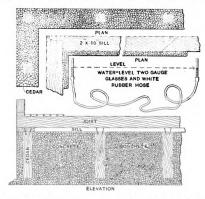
Plan and Elevation of Concrete Foundations with Cedar Anchors Imbedded therein; Also Elevation of a Water Level.
